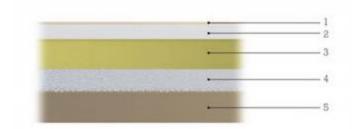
A ground slab normally consists of several layers and a theoretical structure is: 1. Floor covering, 2. Concrete slab, 3. Heat insulation, 4. Capillary layer (single, gravel) and 5. Ground
